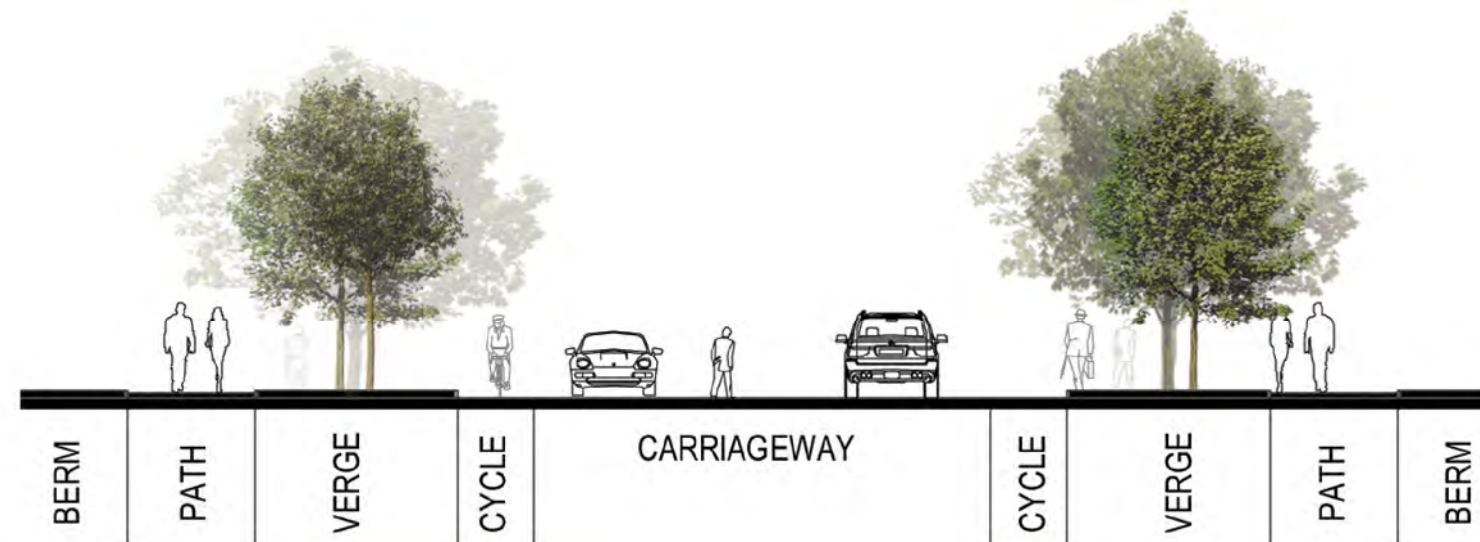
Indicative section showing preferred road layout where possible (parking to be located within the verge)
